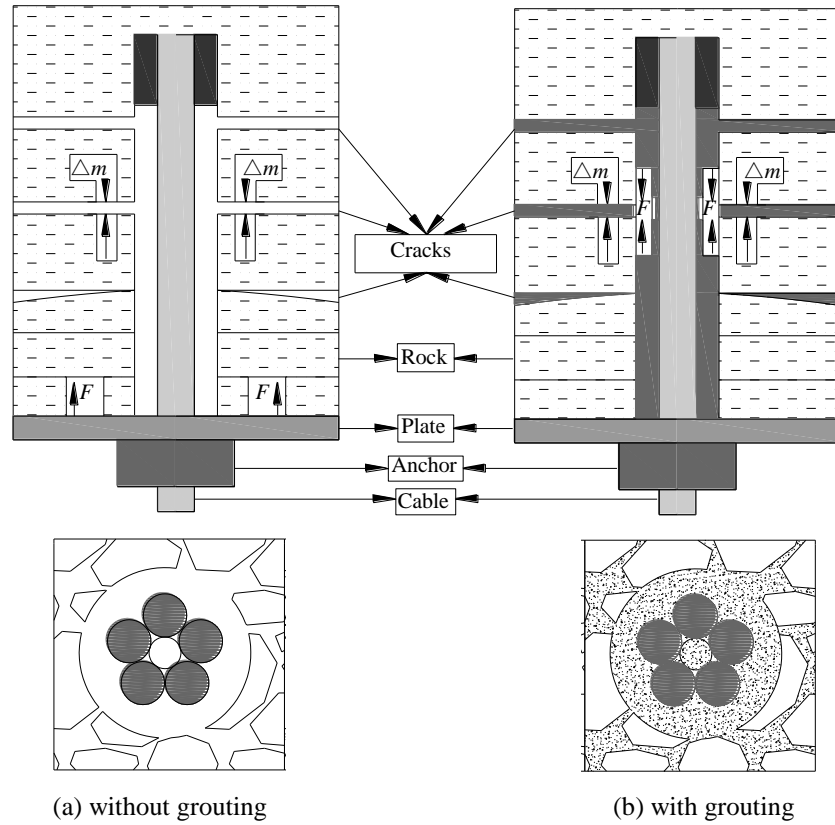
Mechanism of the cable bolt in cracked rock with and without grouting
